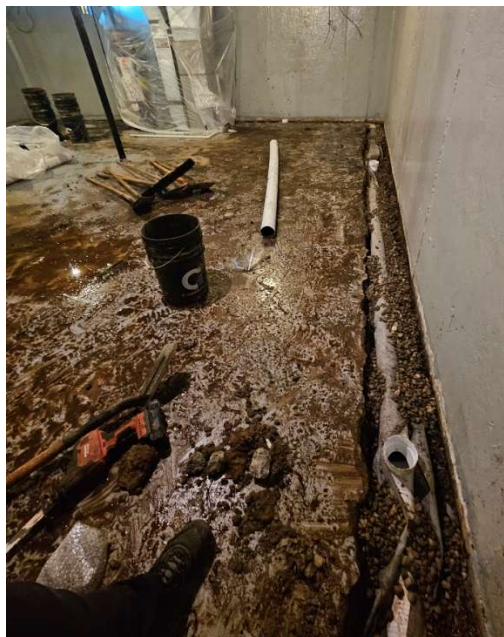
(left): Installation in progress of the replacement perimeter drainage system in the basement.
